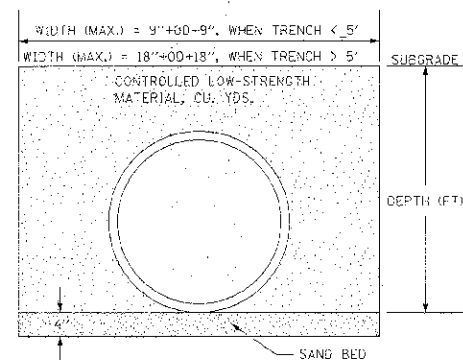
DETAIL OF PAVEMENT REMOVAL AND REPLACEMENT SPECIAL
